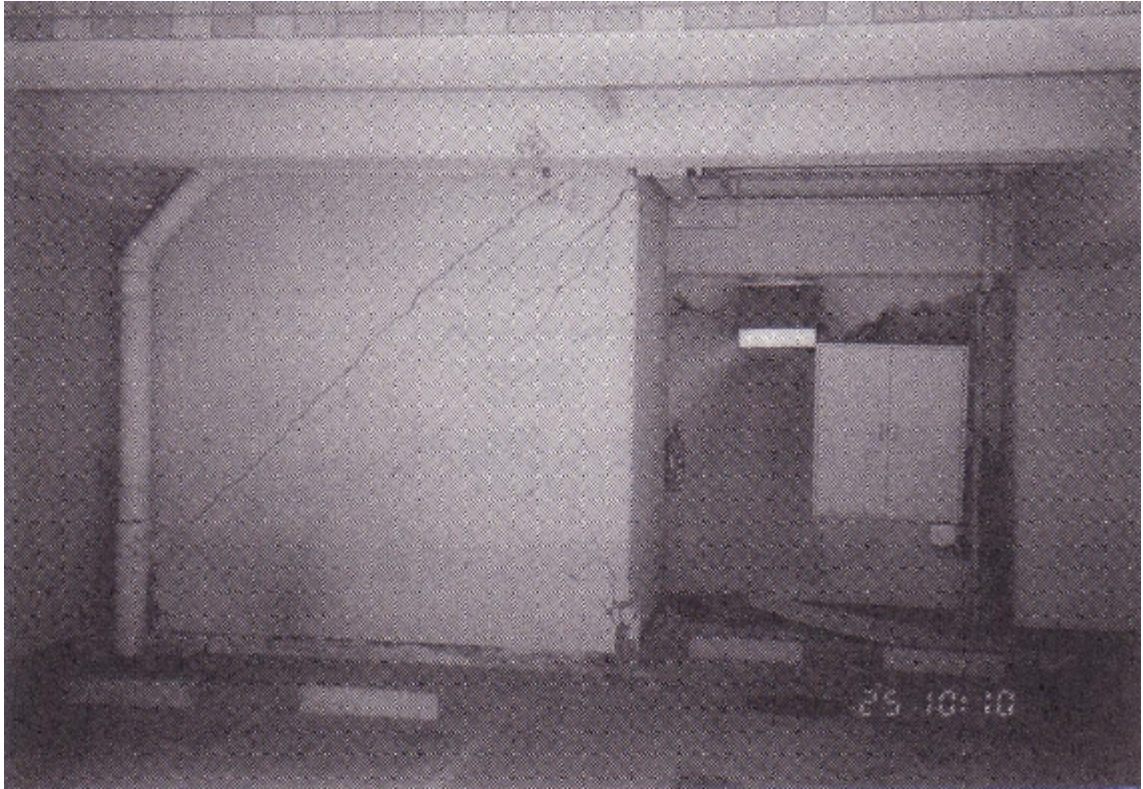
About 2-mm-wide diagonal cracks on the wall without concrete coming off or without compression failure.
